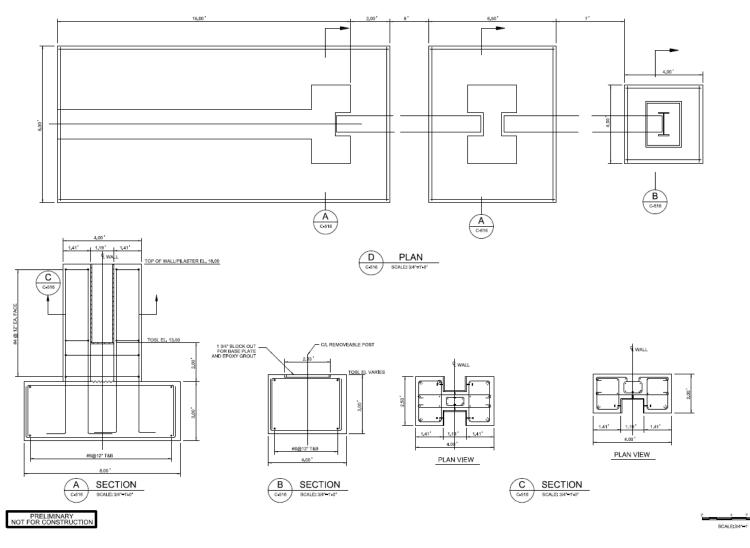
C-514 CONCRETE HEADW ALLDETAILS
